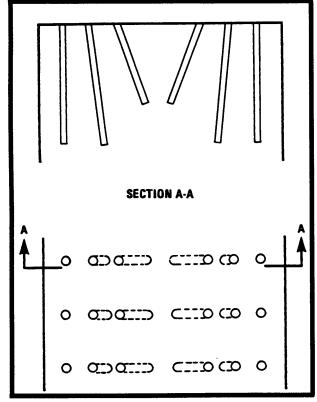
V-Cut to Open a Subsurface Rock Excavation
